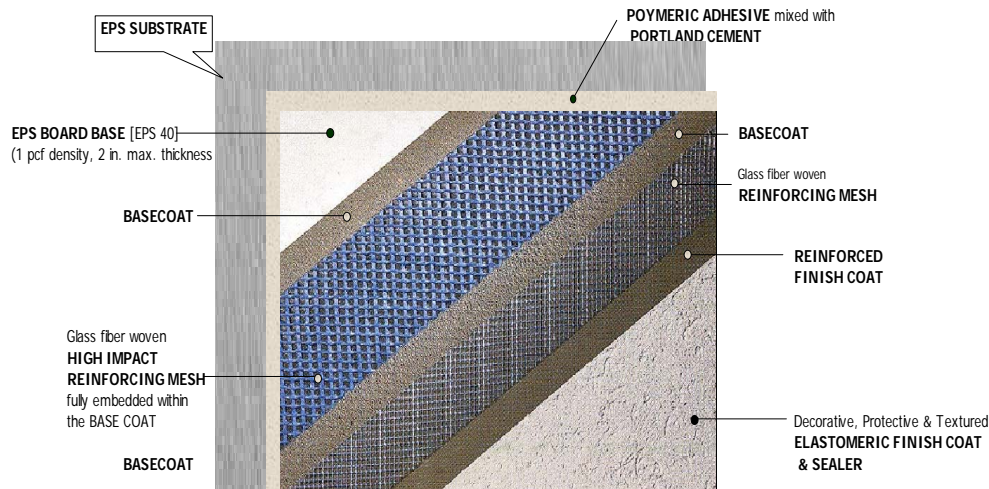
Typical EIFS Cross-Section with an EPS Substrate
